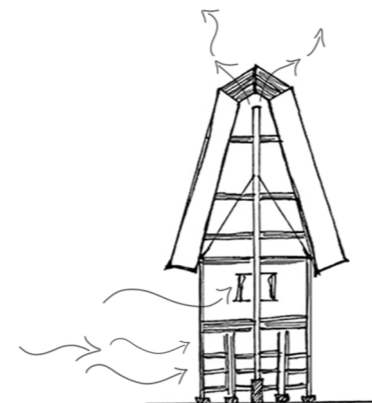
Natural ventilation passive strategies - elevated foundations and roof vents to allow for hot air to exit the living spaces
